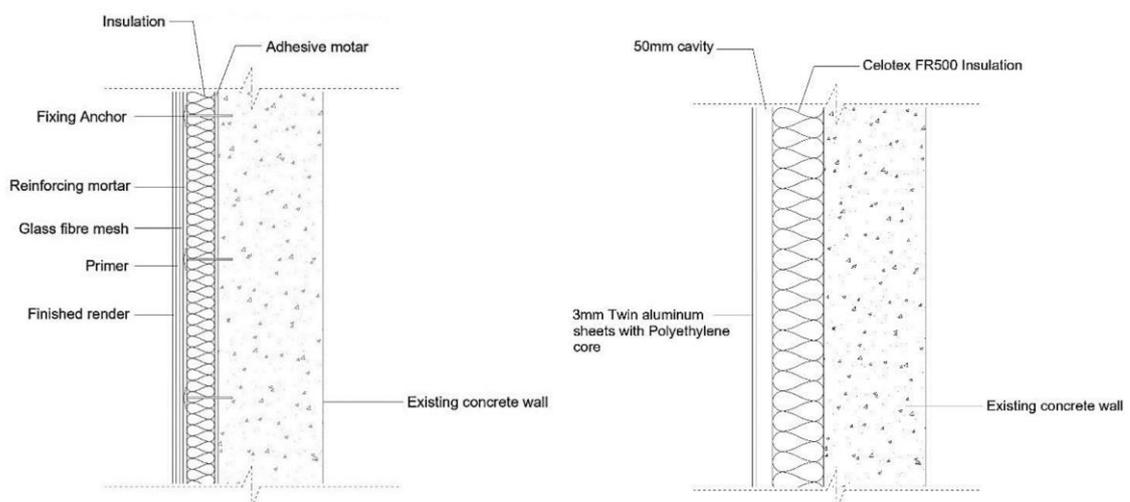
On the left is a wall detail of the proposed exterior refurbishment strategy (EWI) for “Polesworth house”, compared to a wall detail of the previous cladding strategy.
